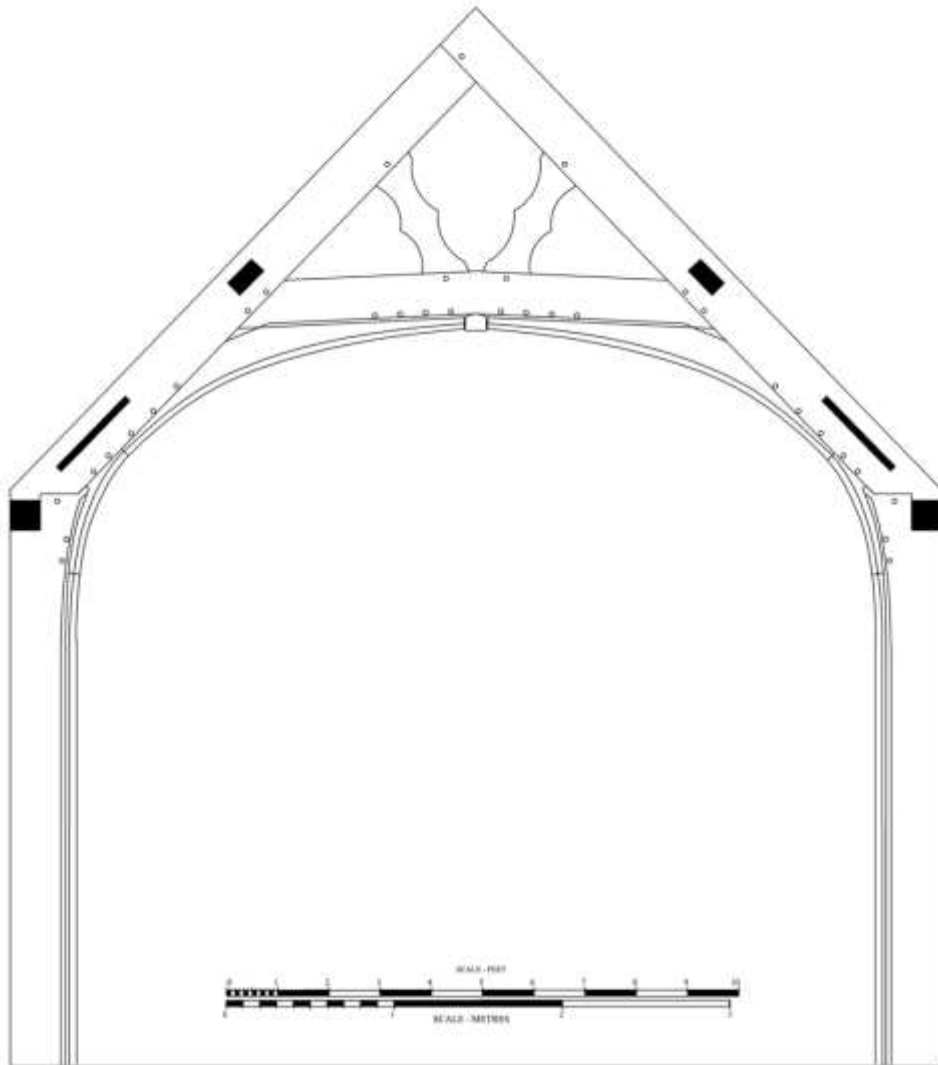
The Old Corner House, principal double-arch braced truss over the hall
